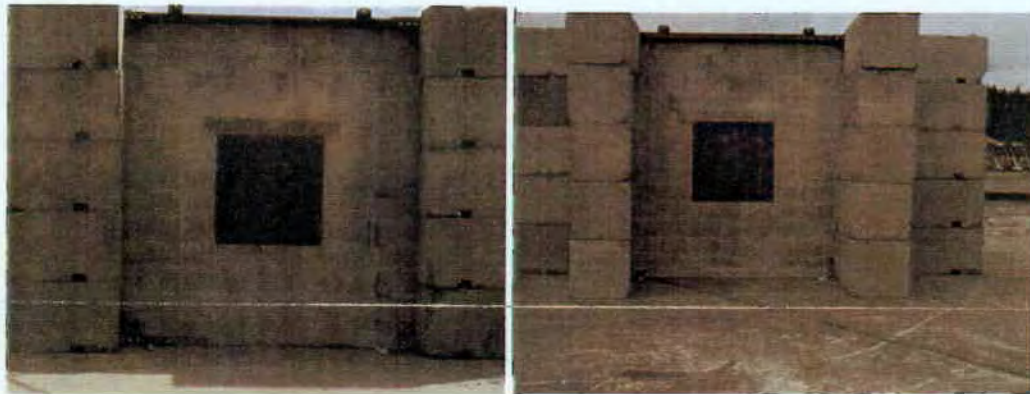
Post test results of the first Blastec Wall Trial – 8 Nov 99. Two identical 225mm (9”) thick masonry walls each subjected to a blast load of 7.8kg (18.1lbs) TNT NEQ at 1m (3.25’). The wall on the left was unreinforced; the other reinforced by Cintec “Multibar Anchors” at 225mm (9”) vertical centres.
